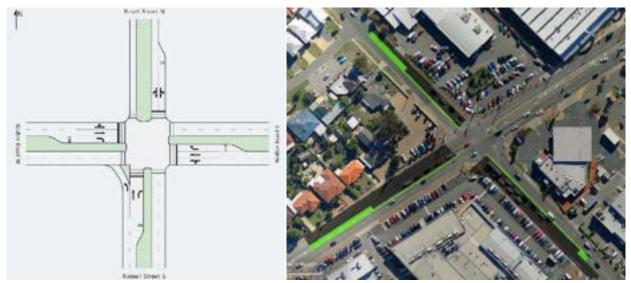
Walter Road West/ Russell Road – Mitigated Geometry
